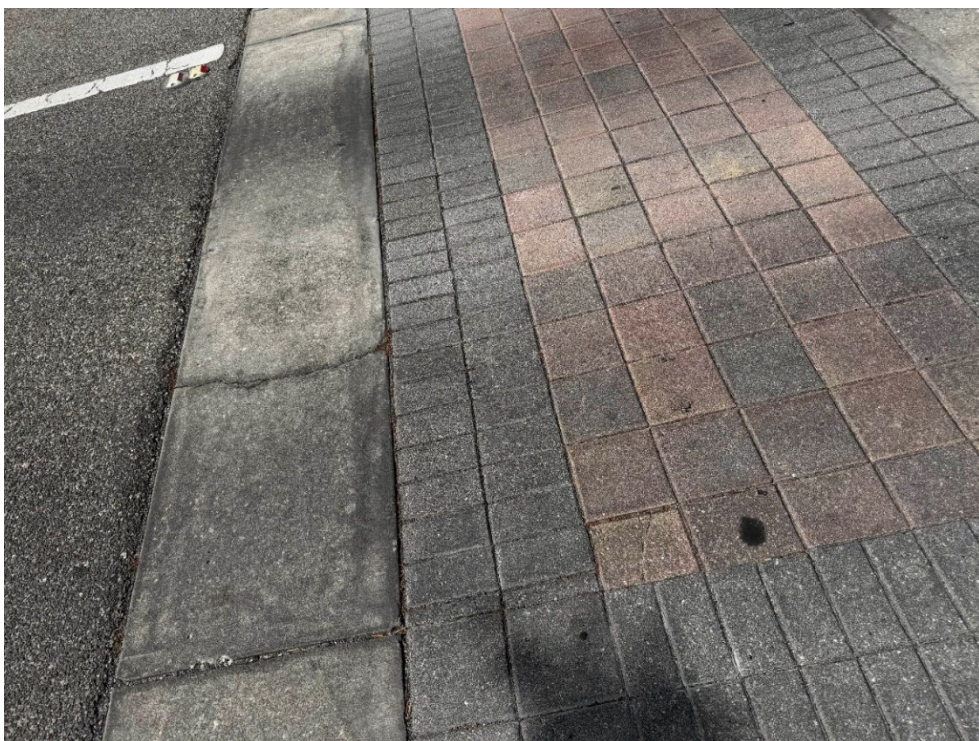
Multiple Cracked Concrete, Pavers Settling, Broken Flush Curb
